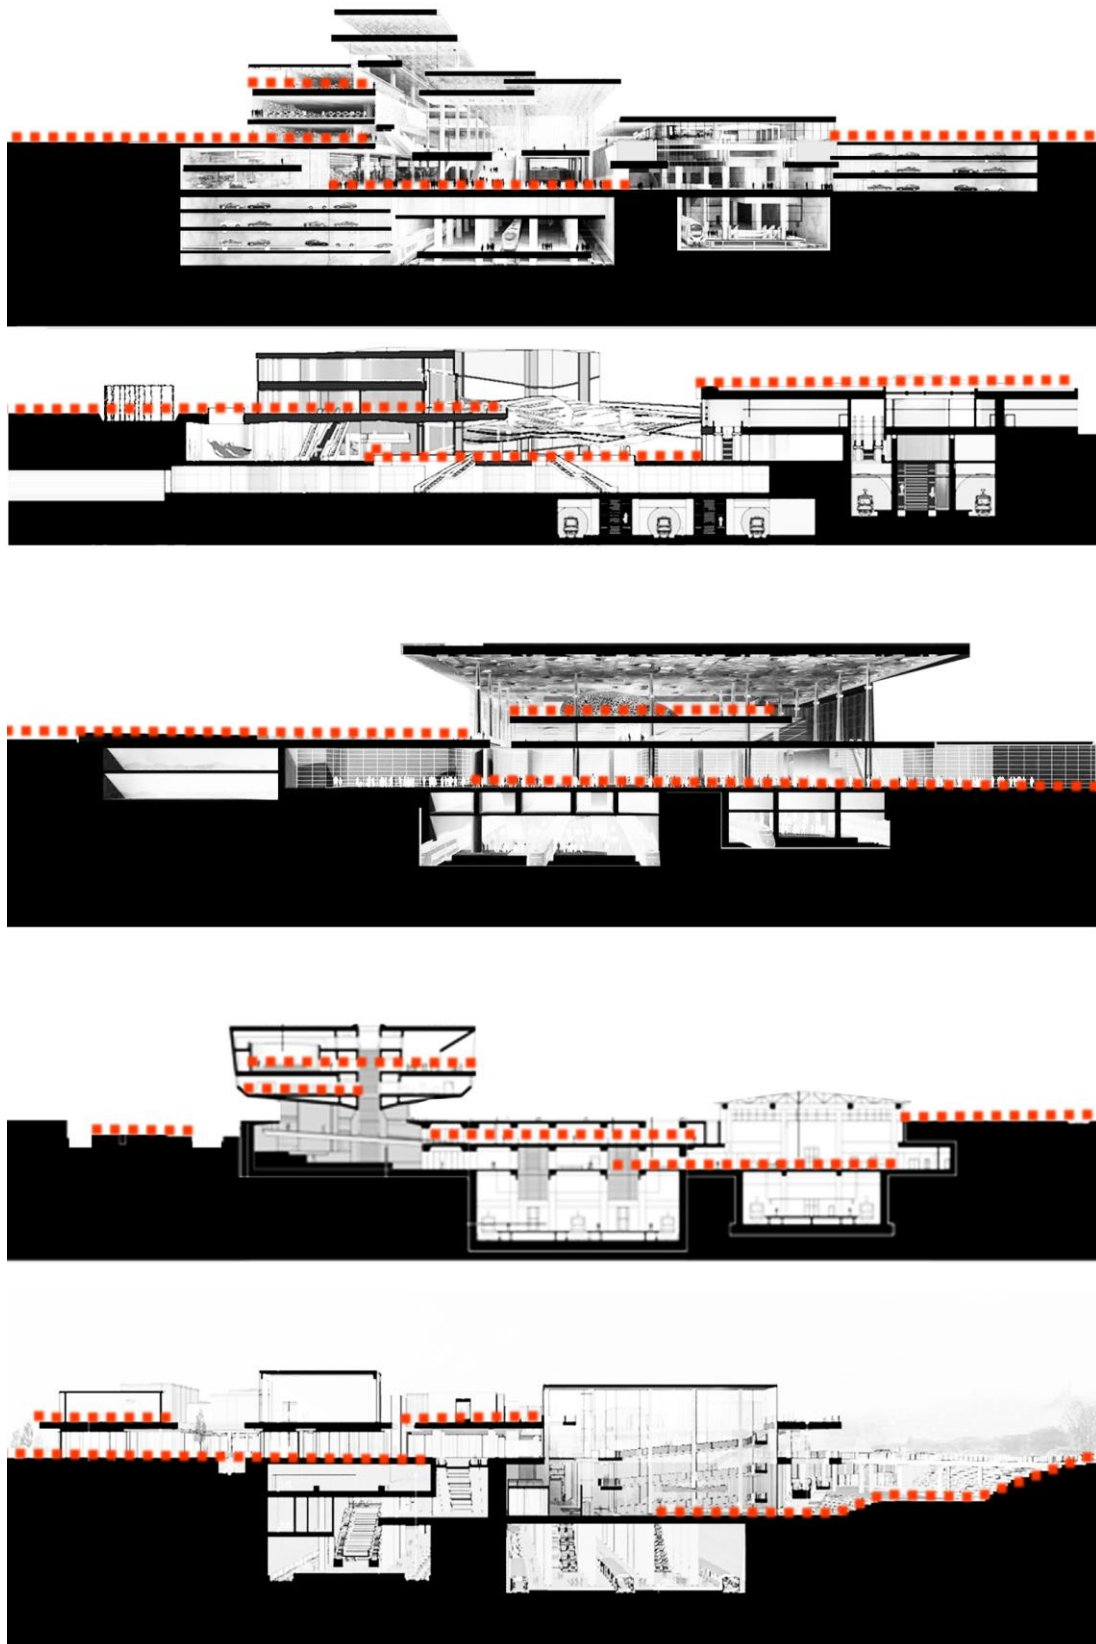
Eisenman Architects and Aytaç Architects Proposal Sections [Url-26].
